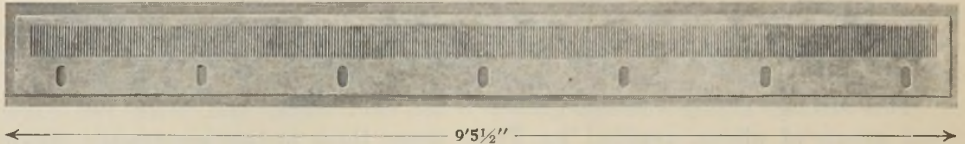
More than 100 of these Everdur weir plates, 3/16 in. thick, were installed in the concrete tanks of the Coney Island sewage treatment works. The 3/16-in. slots are 4 in. long, milled on 3/8-in. centers and relieved on the underside. Plates are anchored with 1-in. by 2-1/2-in. Everdur bolts.
